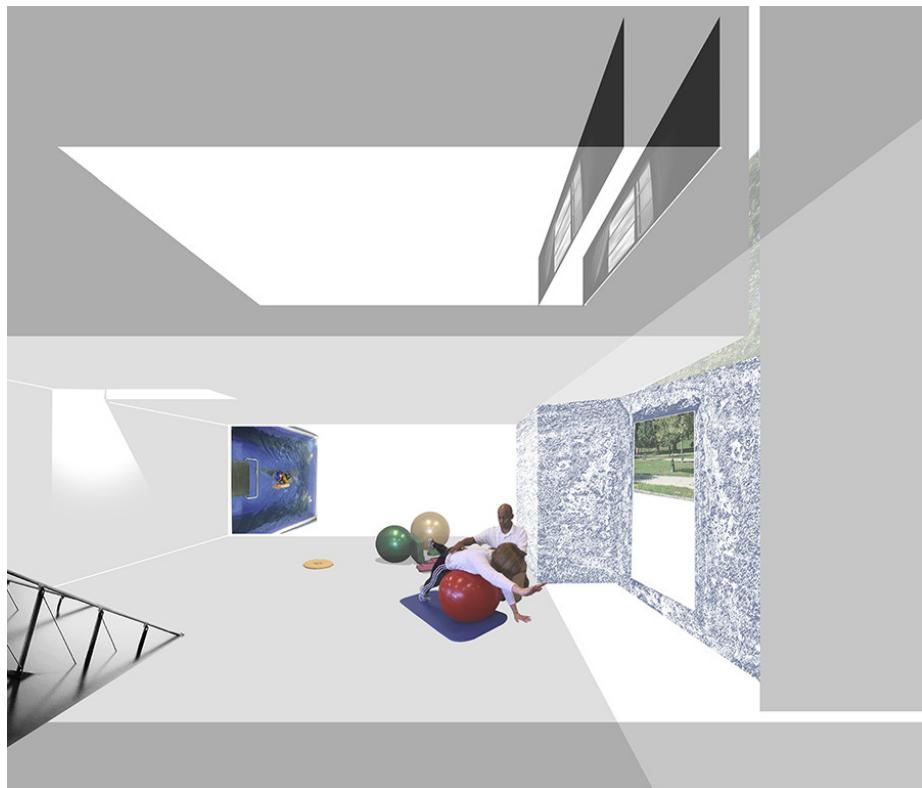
Conceptual Collage. The site response will require an attitude toward the 4 ft elevation change and the adjacent park. The collage shows a ramp descending the half-level, and glazing biased toward the park. On the floor above are hints of a light shaft and the distinct presence of a single room as a space between. Access to the outdoors and the vitality of park and garden will be prioritized as well.
